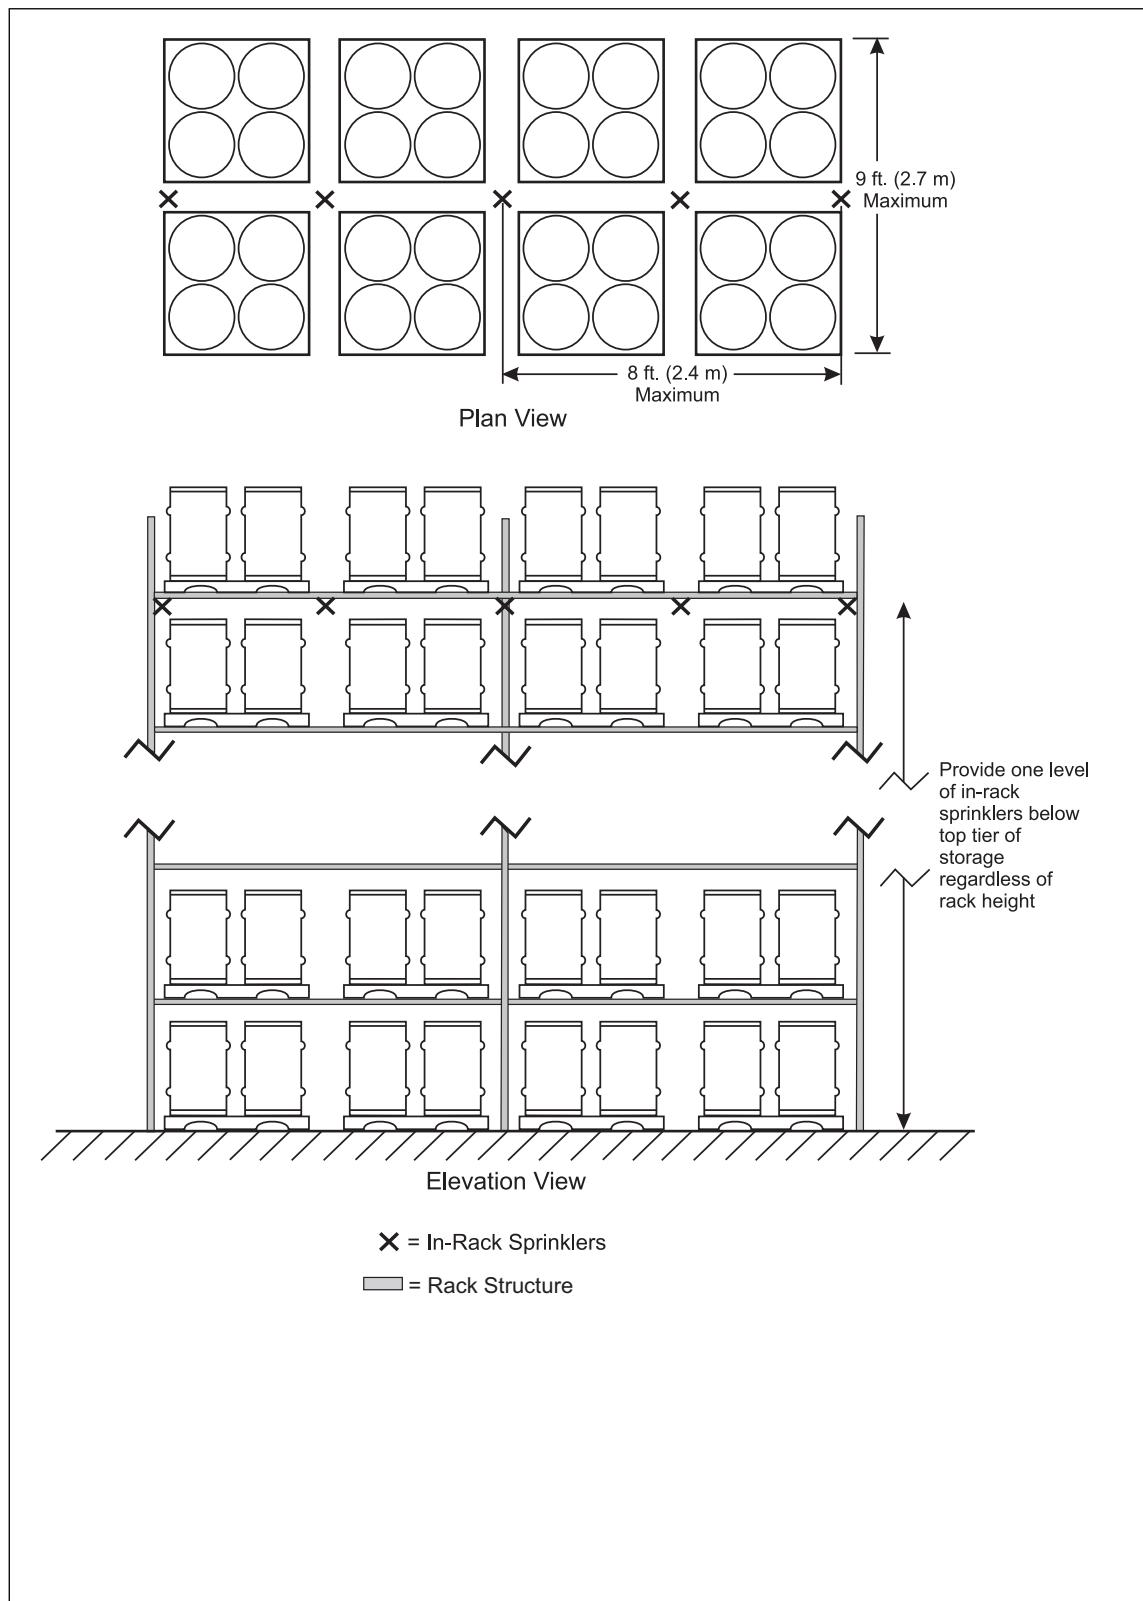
Double-row rack sprinkler layout: drum protection scheme
